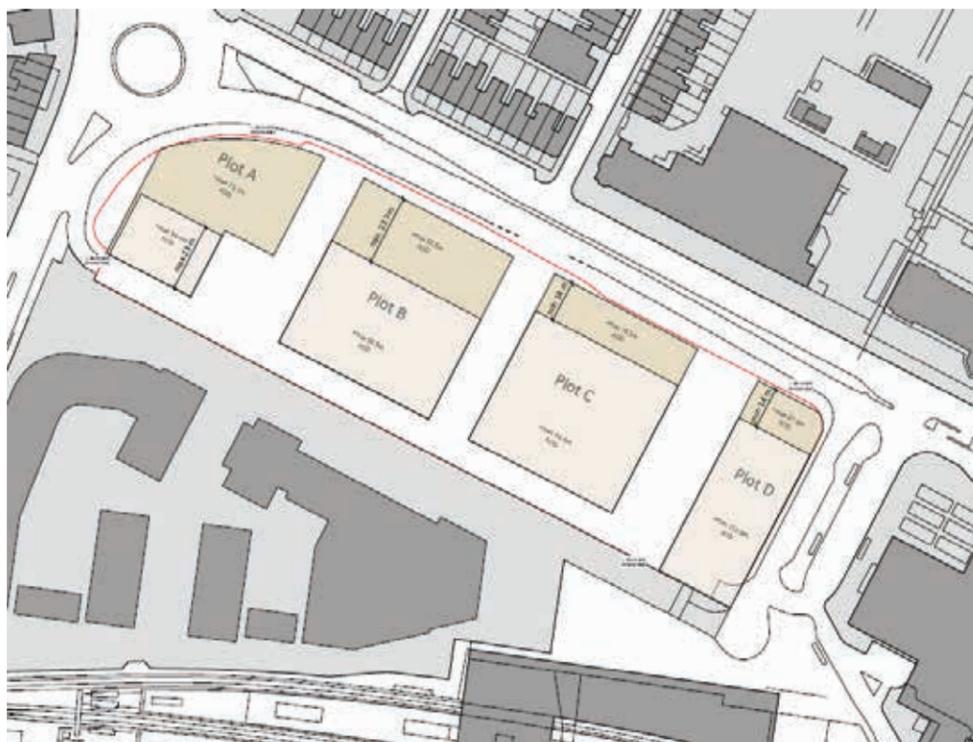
Parameter plan 105 – Plot Heights Mixed Use (source: ColladoCollins Architects)
